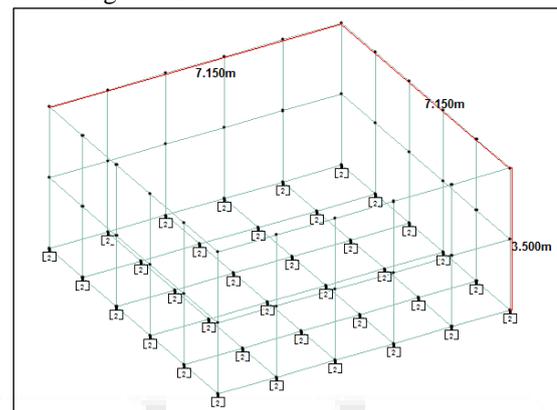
Dimensional Model of Tank (Center to Center Dimension of Tank Wall)
